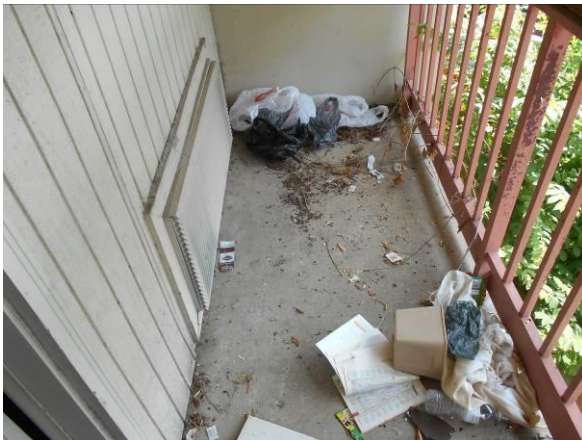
View of the exterior porch with an individual wall mounted HVAC unit.
